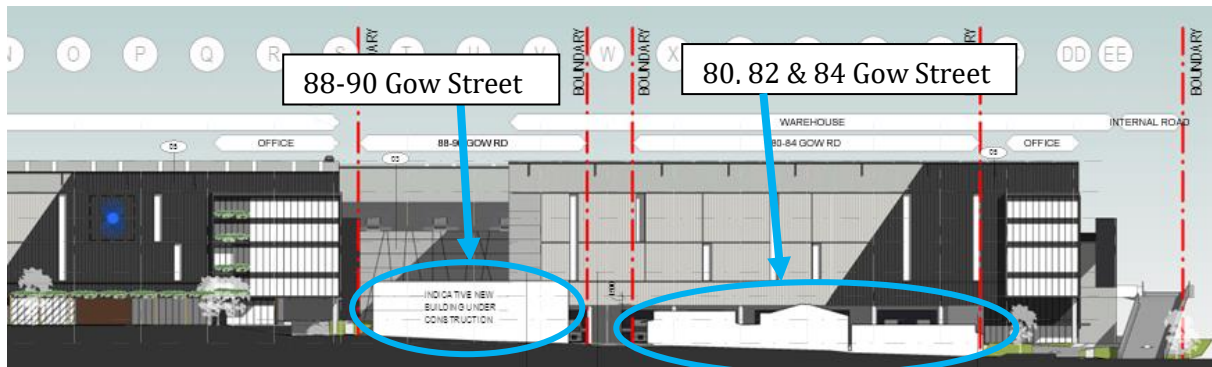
Proposed South Elevation (Source: Nettletontribe, Drawing No. PML-NT-AR-DA201 Issue P9)
